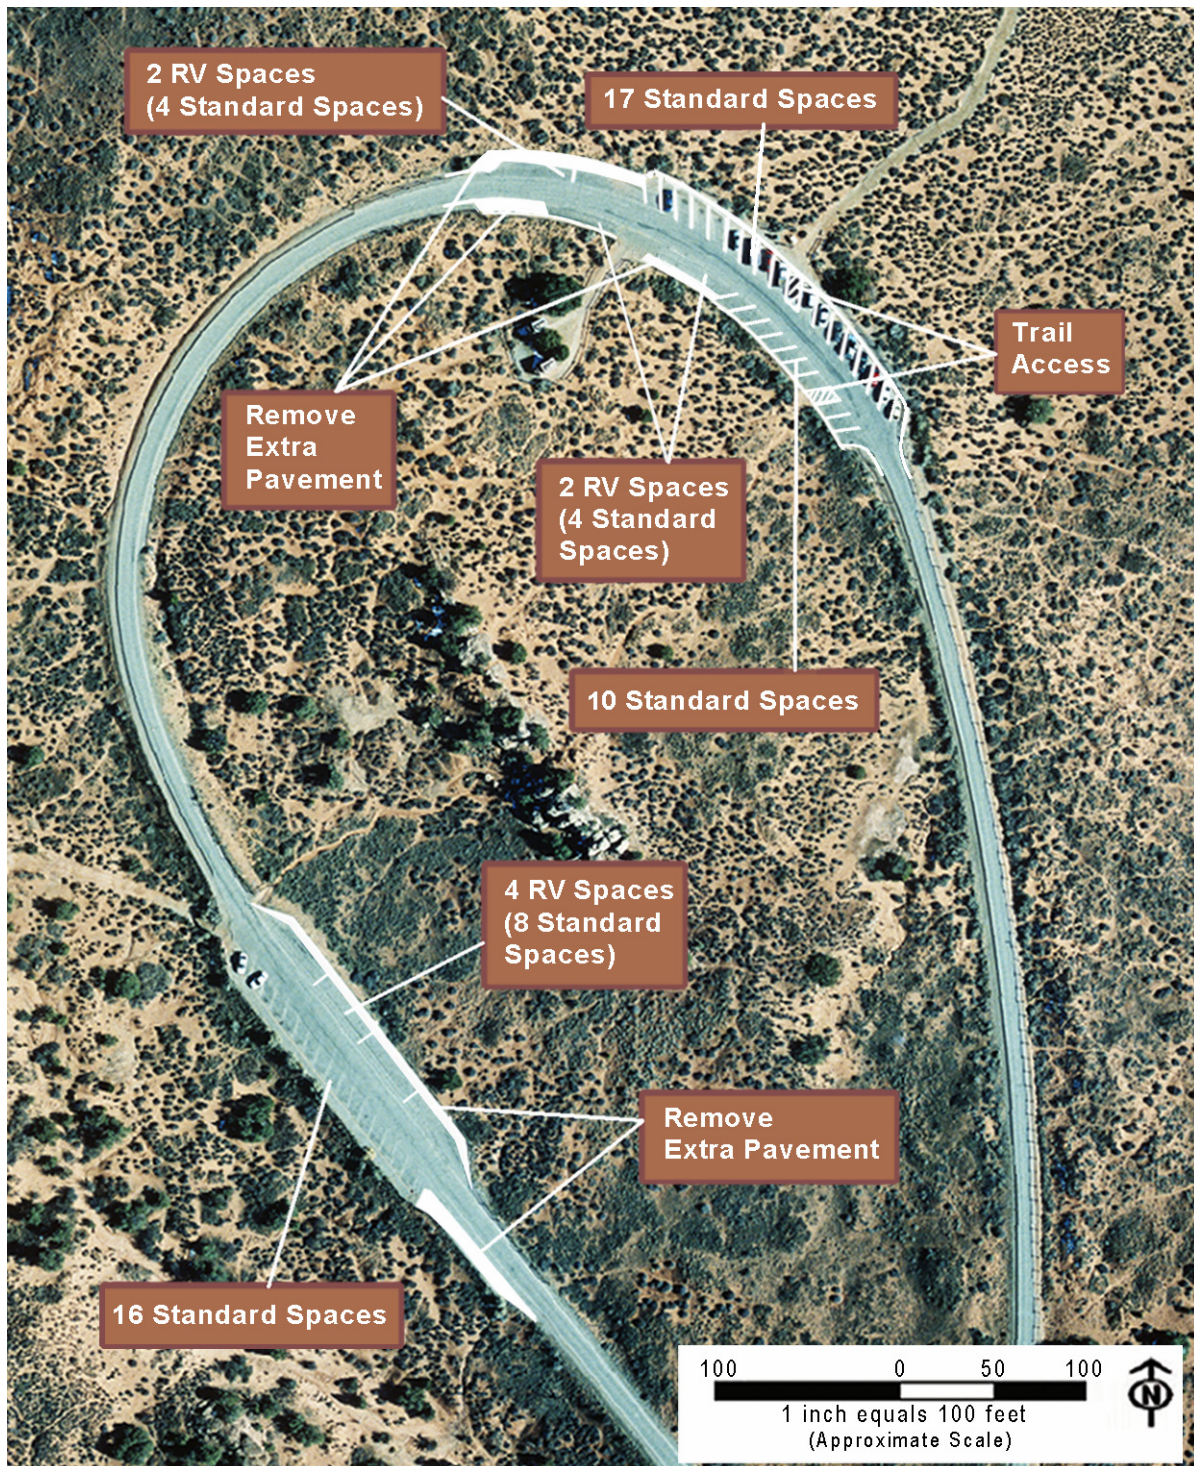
Proposed Improvements to the Sand Dune Arch Parking Area
